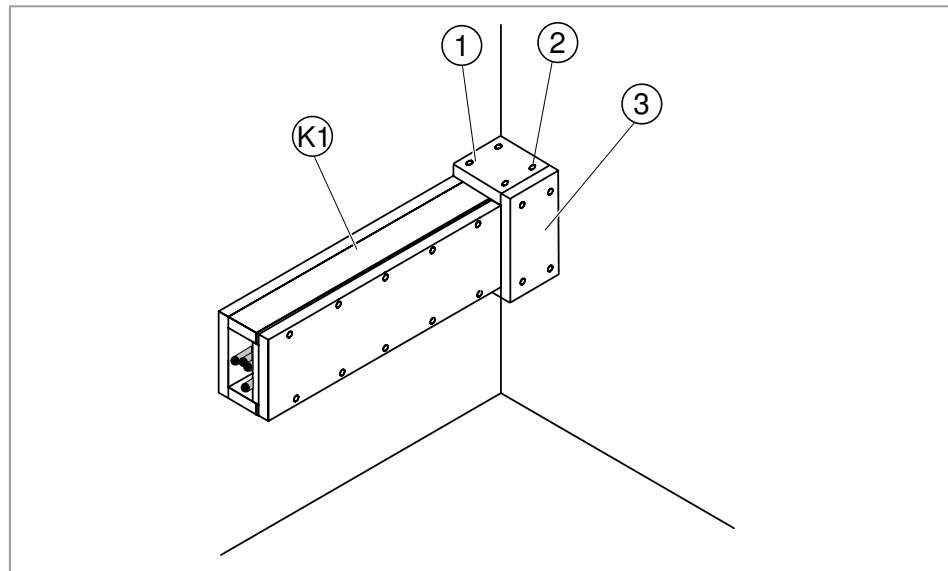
Overview, PYROLINE® Con D PLC wall connection collar
